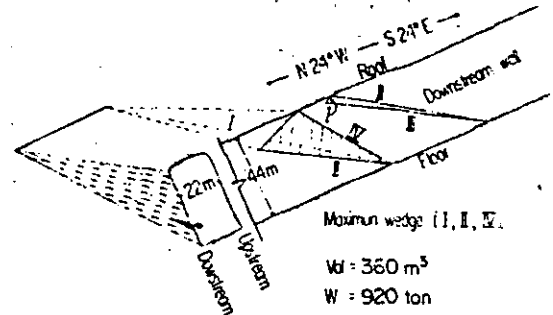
Longitudinal and cross sections of the powerhouse showing the maximum wedge in the downstream wall
